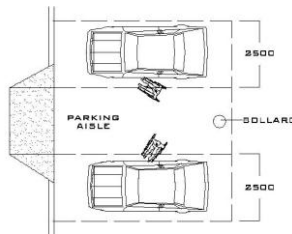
New design with bollards to get two accessible parking spaces and accessible aisle
